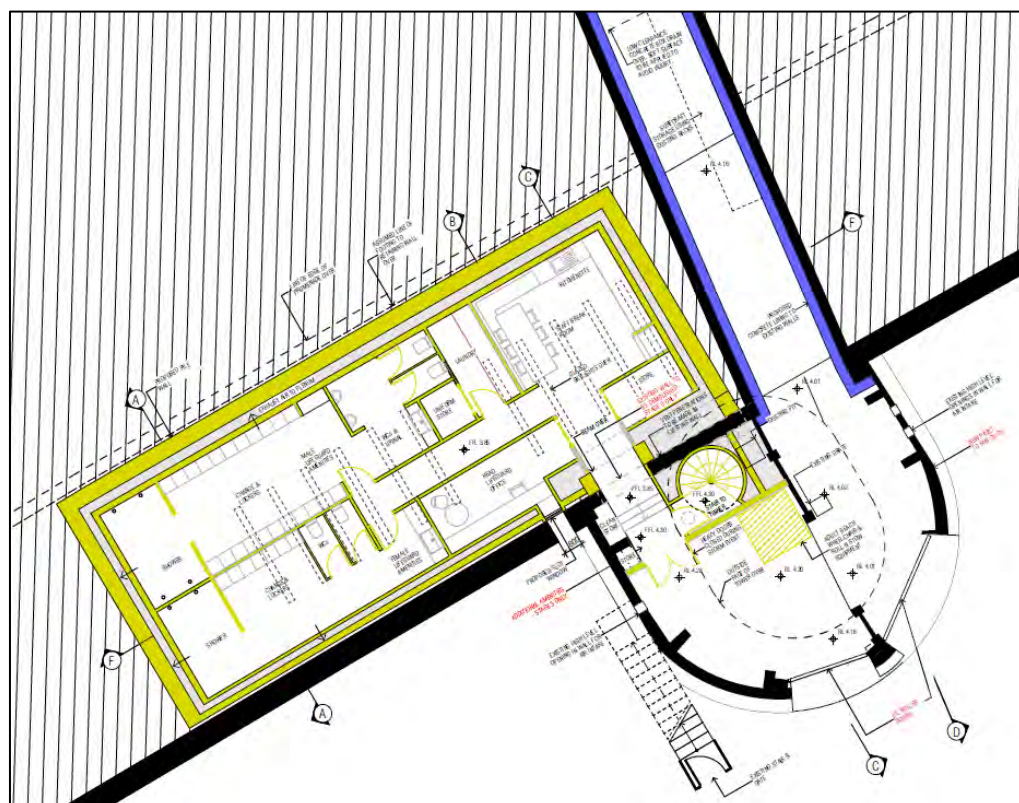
Proposed modifications to site plan of Lifeguard Tower and Tunnel 2 (demonstrated in blue).
